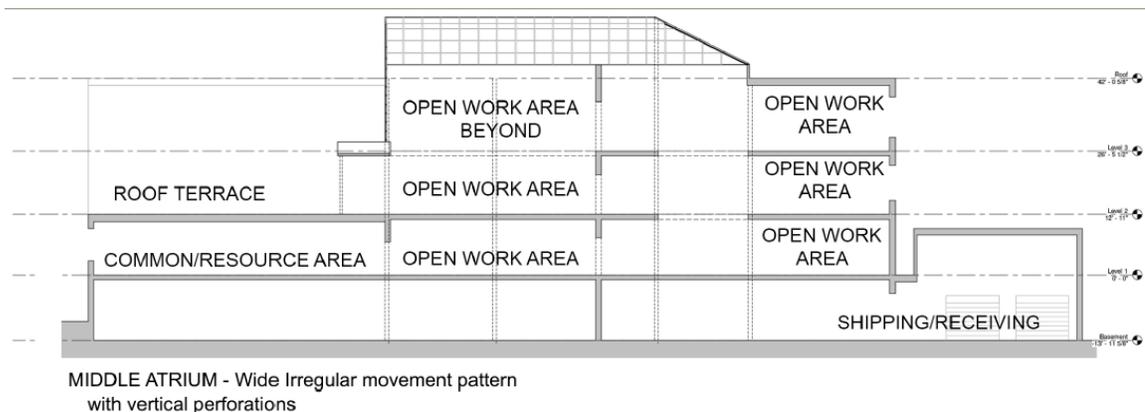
Atrium Section. Note: Image created by Luke Beck
